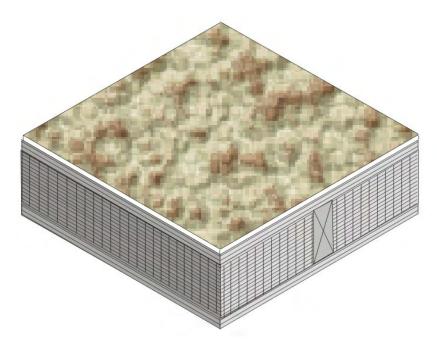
Wood Foam Panel (SIP) Floor
